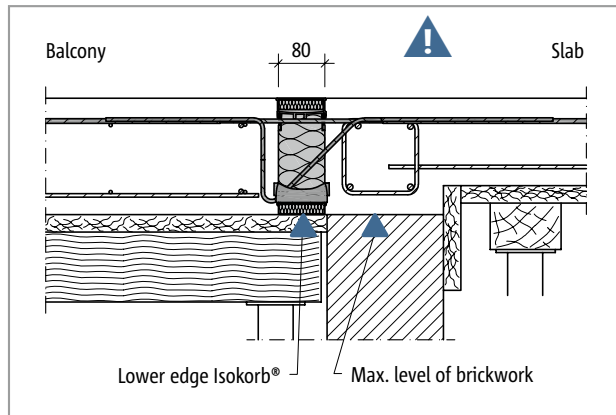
Schöck Isokorb® T type K: In situ concrete with height offset floor on masonry wall
